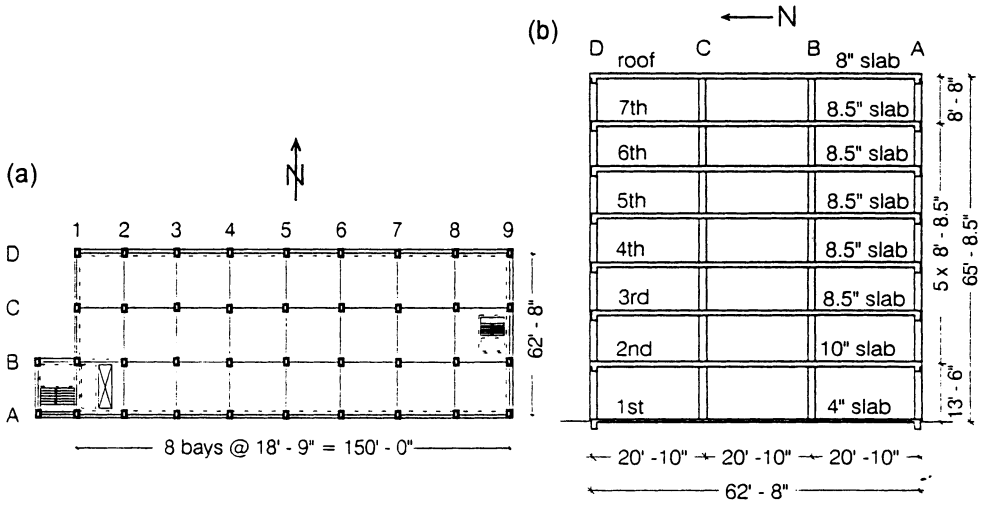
(a) A typical floor plan, and (b) a typical transverse section for the 7-storey hotel.
